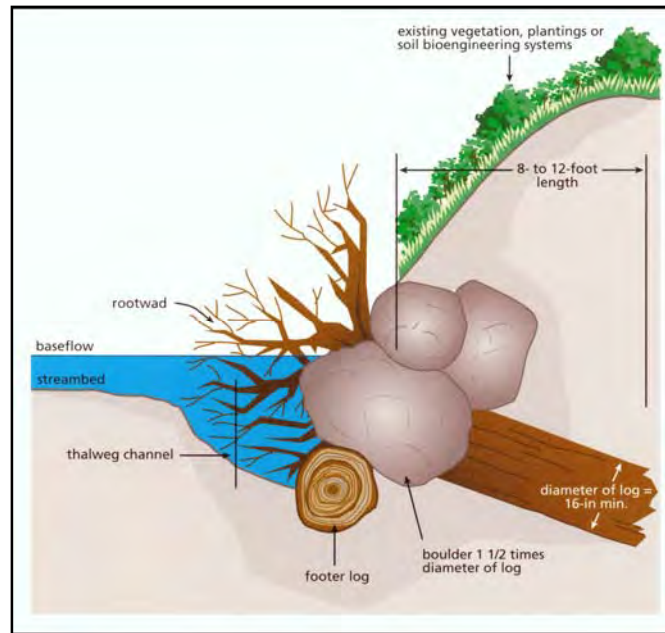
Details of Root Wad and Boulder Revetment Technique
